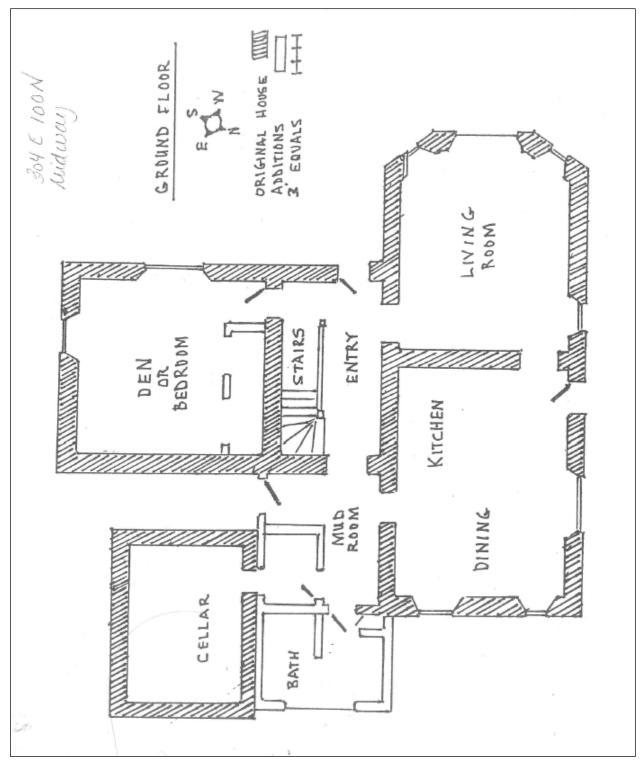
Sketch plan of ground floor of Hancock House (Blaine Dabb 2011).
